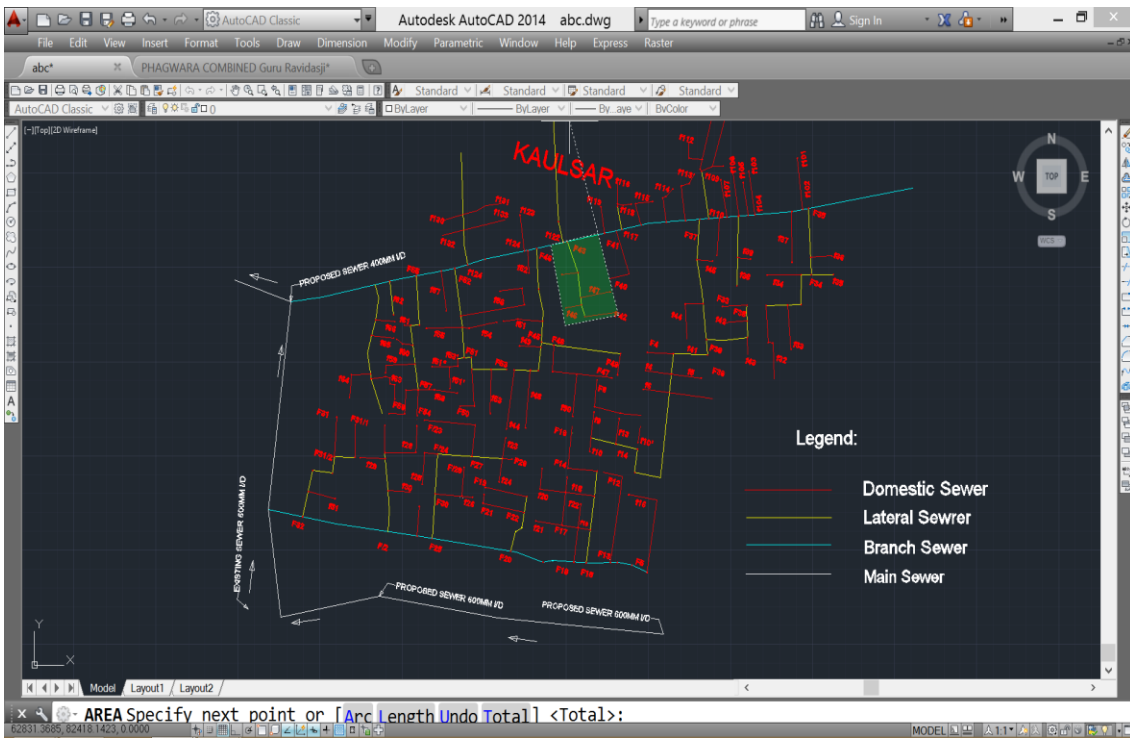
Zoomed Section of an area from the above CAD drawing
